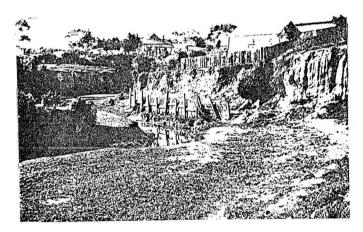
Eroded banks and retaining fence downstream of Salisbury Street, Moonee Ponds, September 1935
